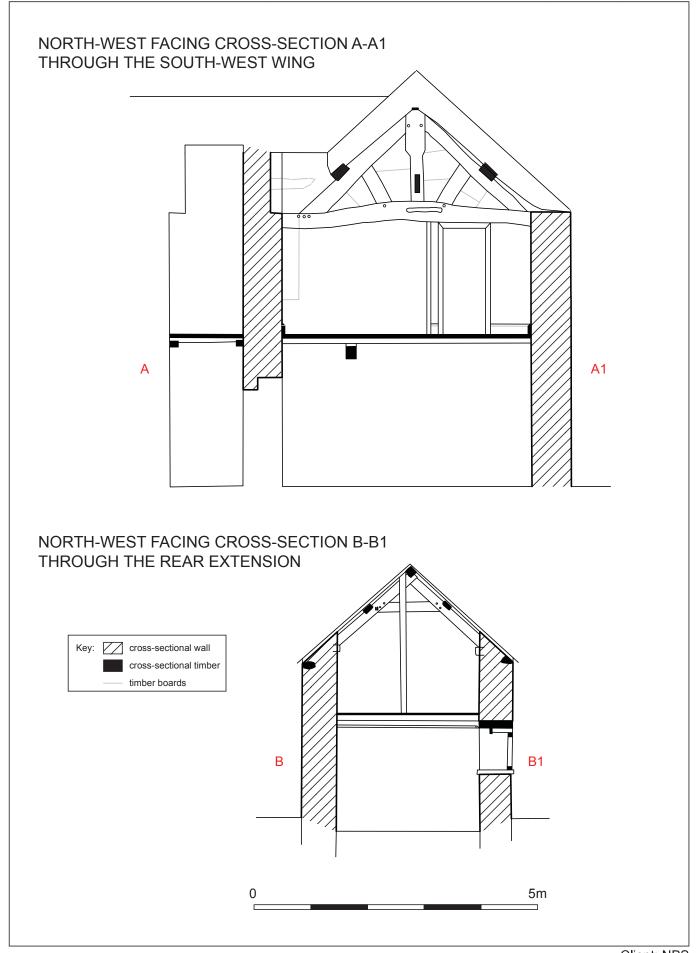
North-west facing cross-sections through the south-west wing and the rear extension
